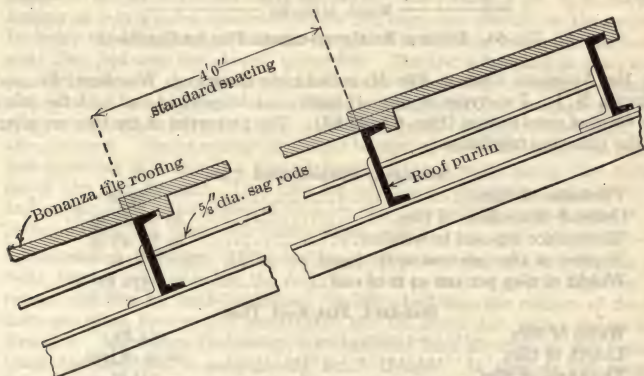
Bonanza Reinforced-cement Tiles for Pitched Roofs
